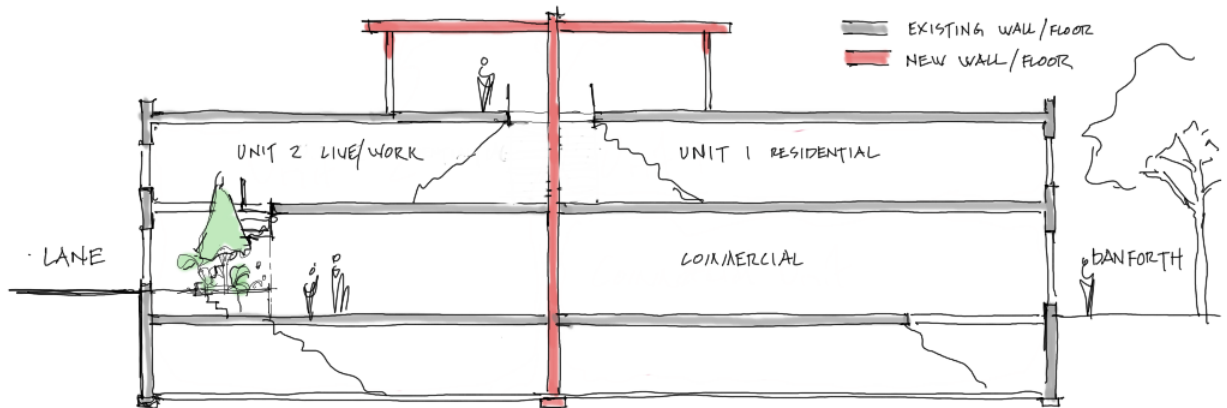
Proposed Building Section showing 2 residential units and 1 commercial unit
